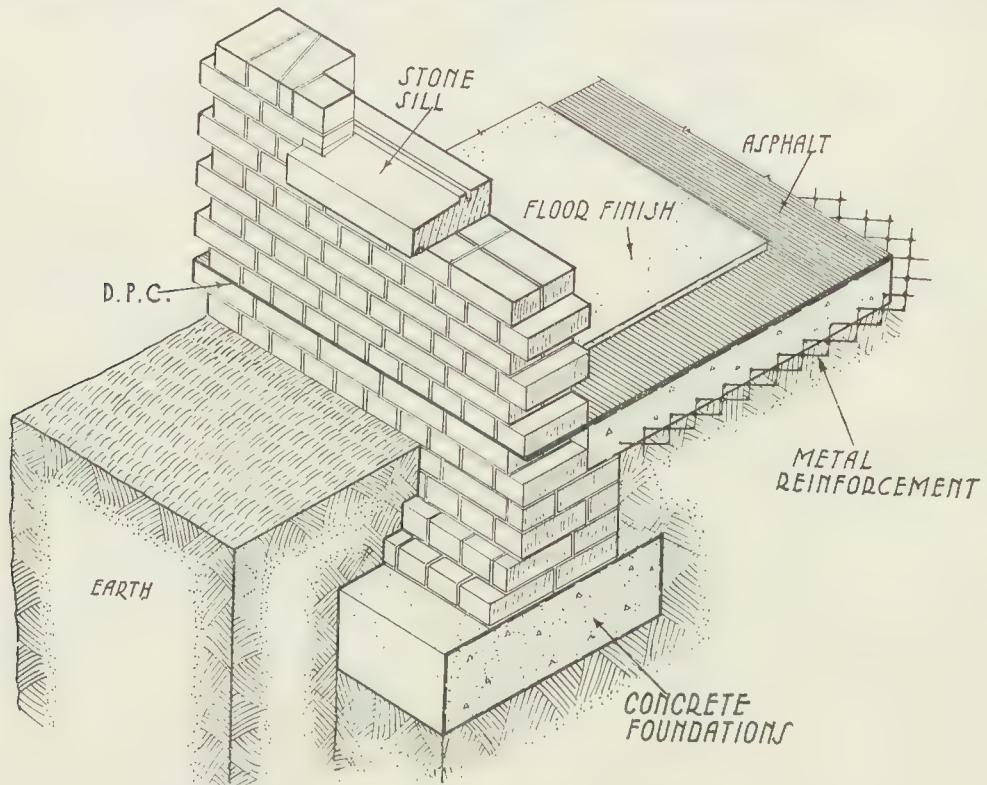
BASE OF BRICK WALL AND REINFORCED CONCRETE GROUND FLOOR
